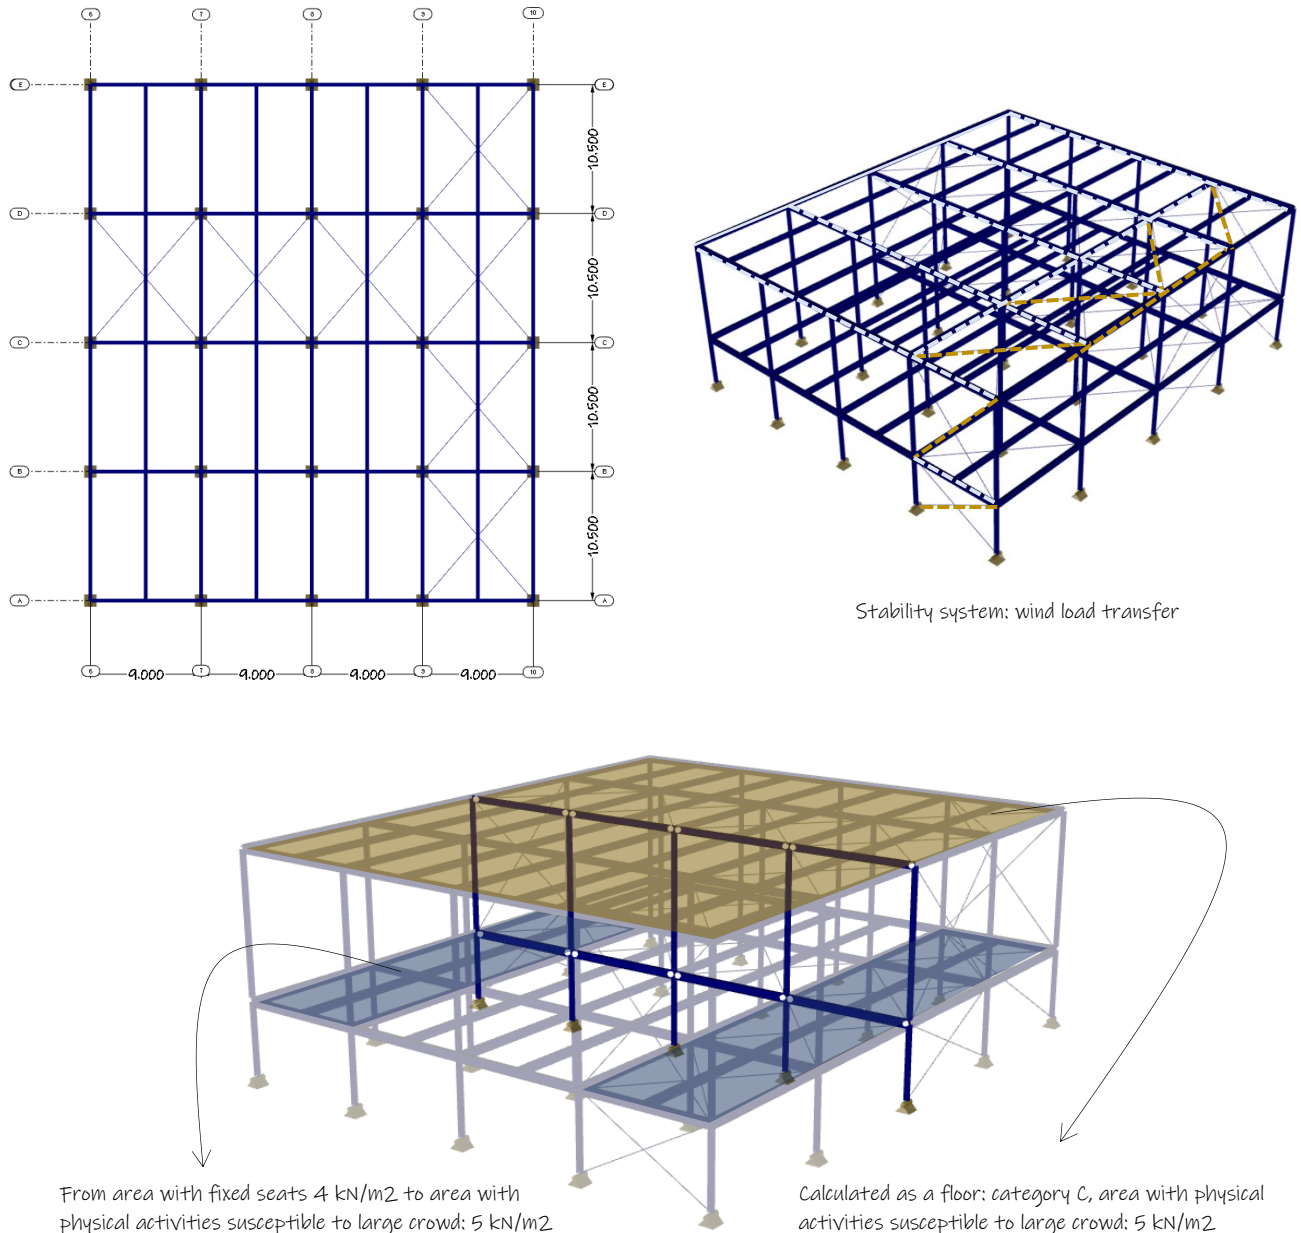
Demountable Convertible Scalable design conceptual structural overview: floor plan, and stability system and structural consideration on surplus capacity.
